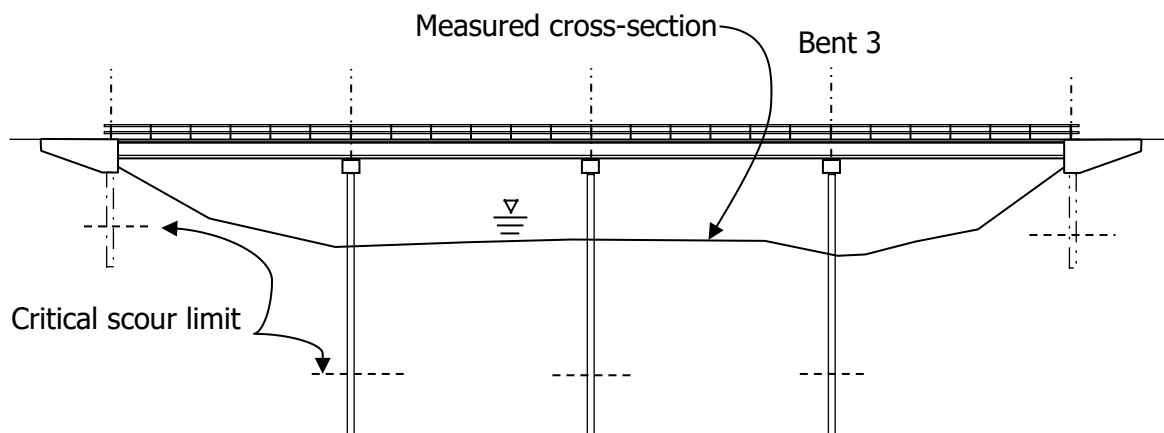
Elevation view showing scour elevations and stream cross-section for a bridge.
